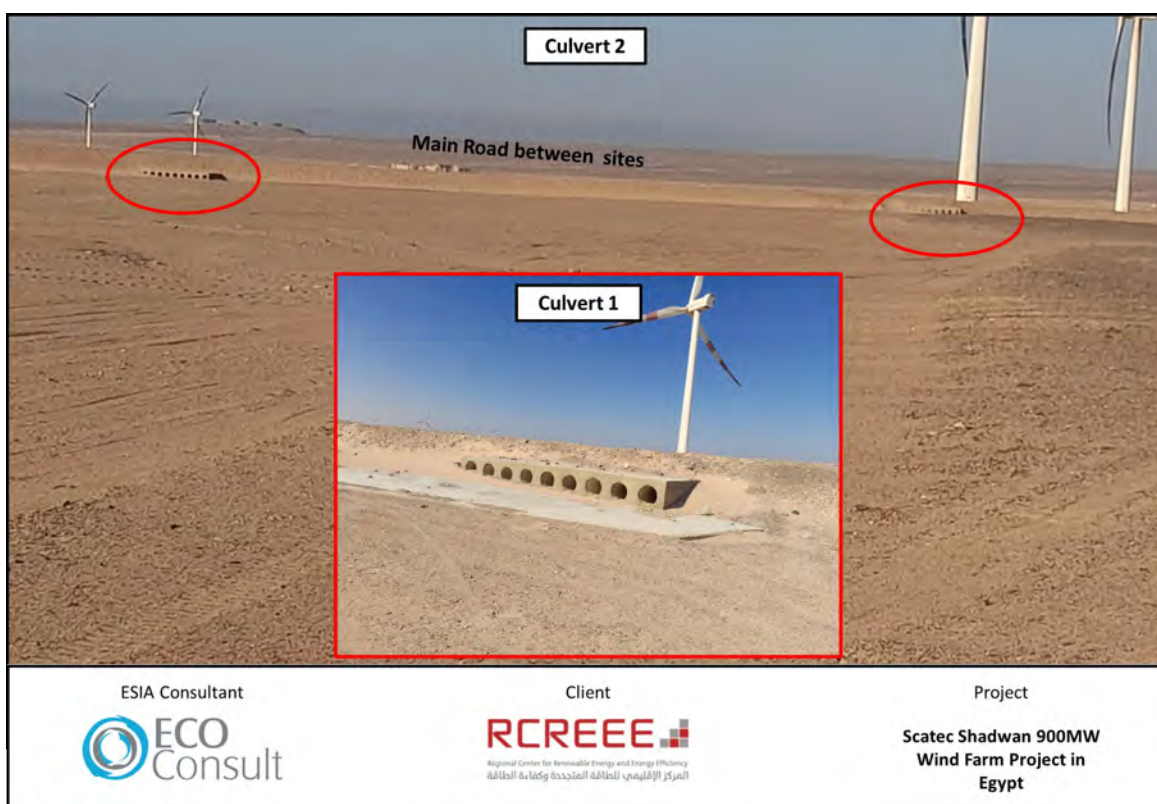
Culverts Installed Under the Main Road to Facilitate Safe Passage of Surface Runoff
